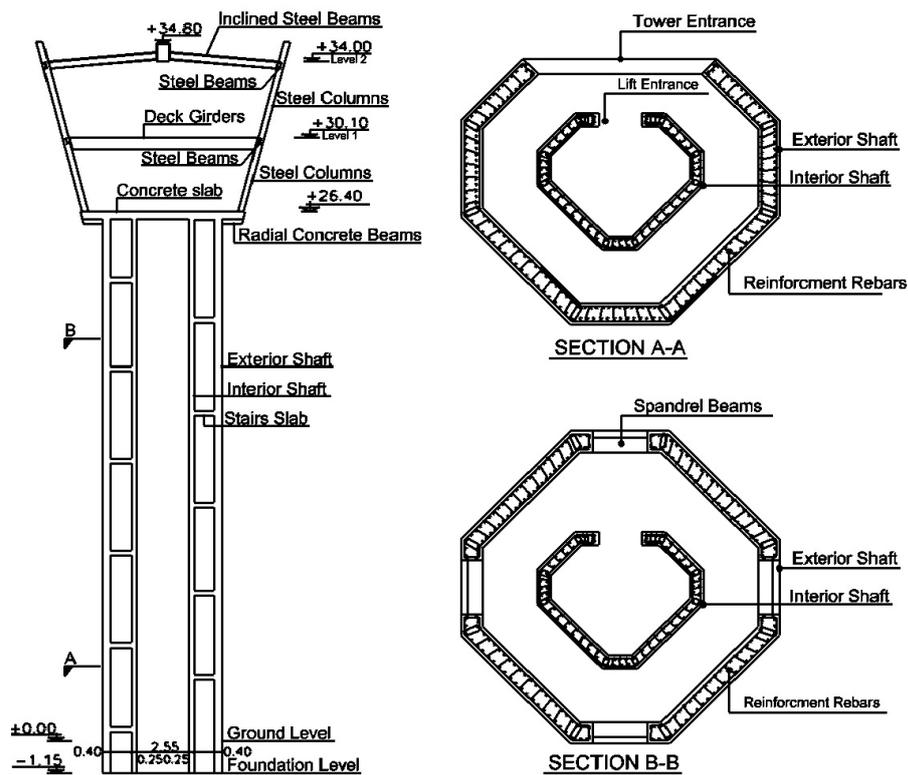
Longitudinal and cross-sections of Kerman ATC tower.
